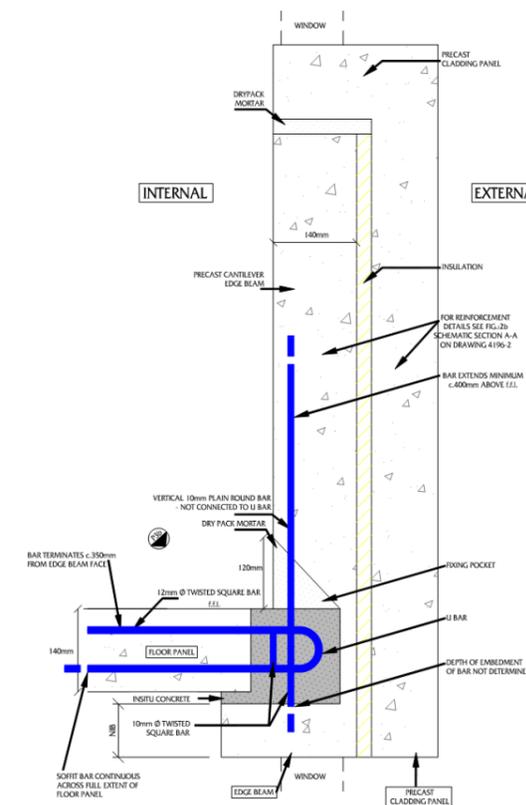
connection of floor panel to cantilever edge beam (from GBG report)
